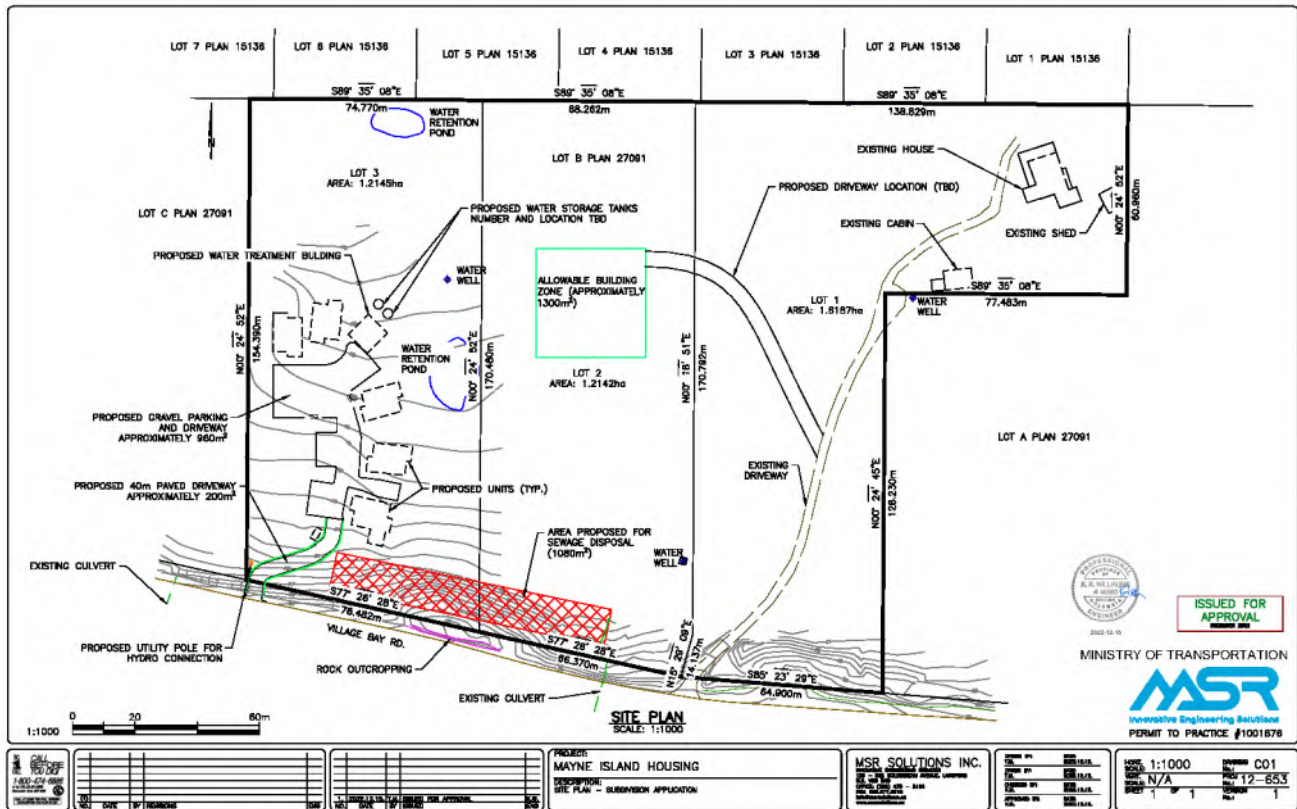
Subdivision Plan (MA-SUB-2023.1)
